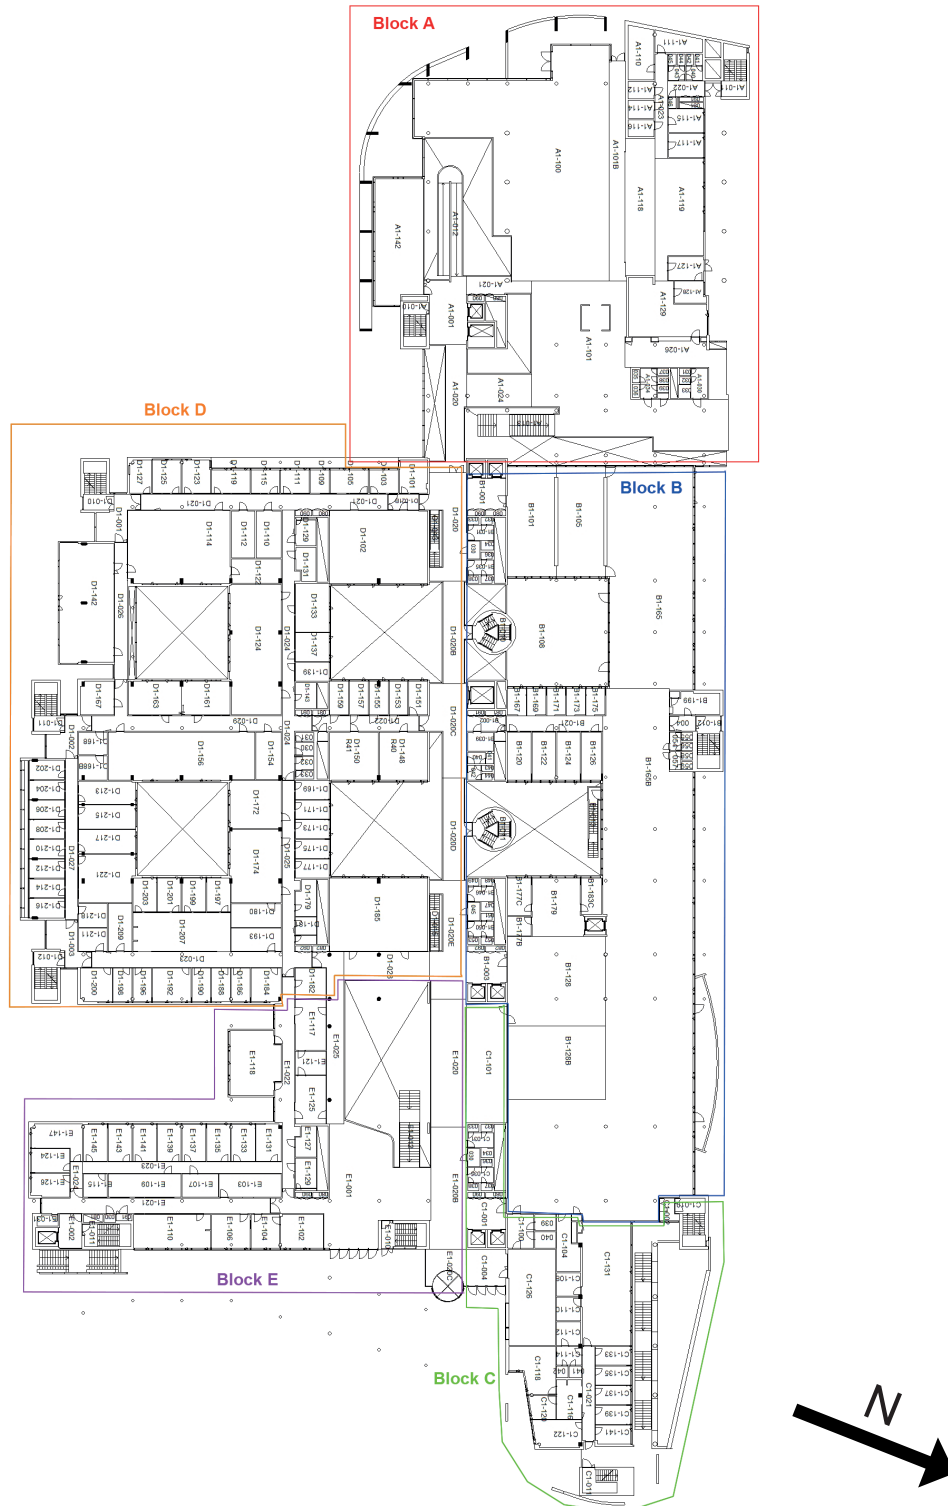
Edited floor plan of the first floor at Realfagbygget (NTNU 2014a).
